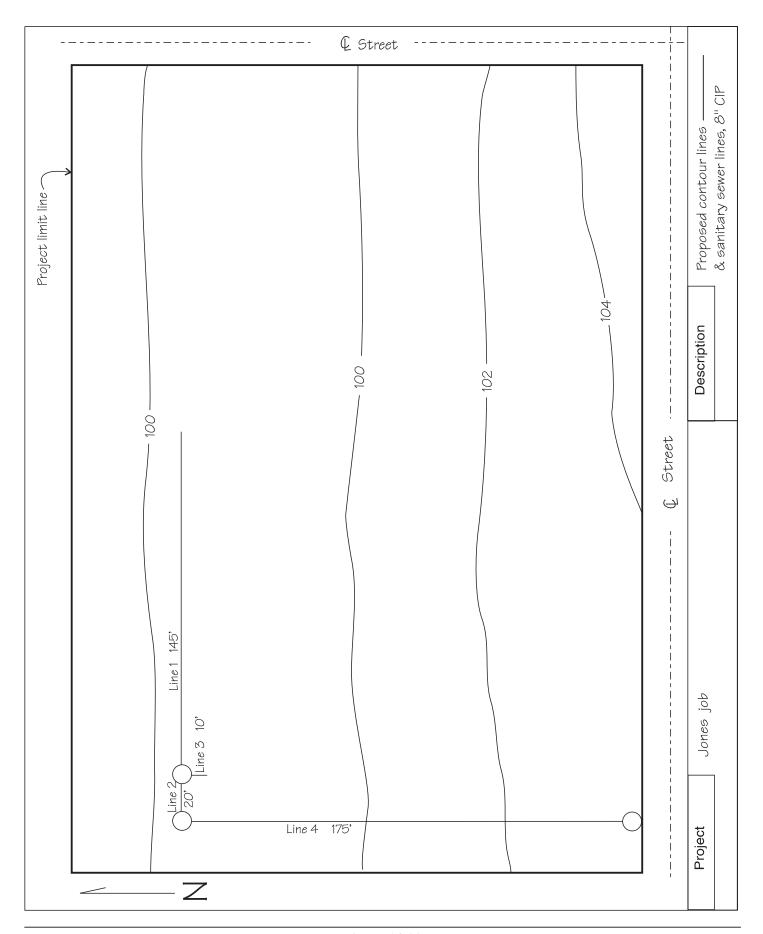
Sanitary sewer system plan sheet shown with proposed contours
